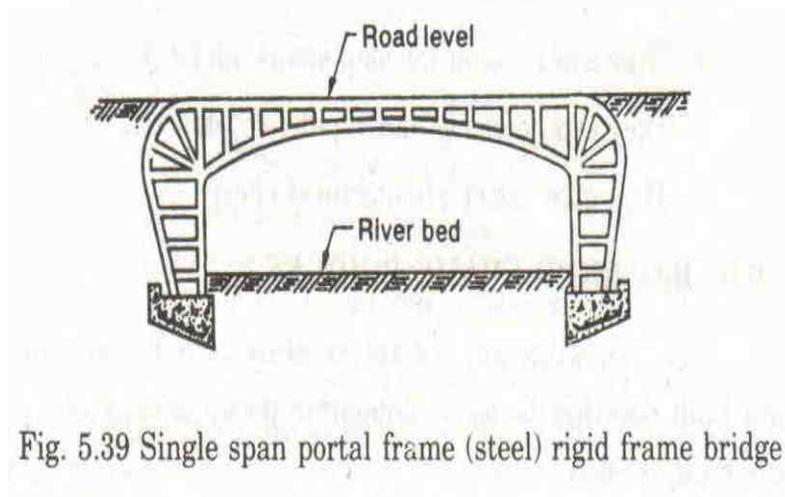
Single span portal frame (steel) rigid frame bridge
